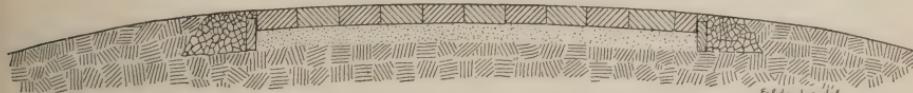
Cross-section of brick road, Monmouth, Ill.
